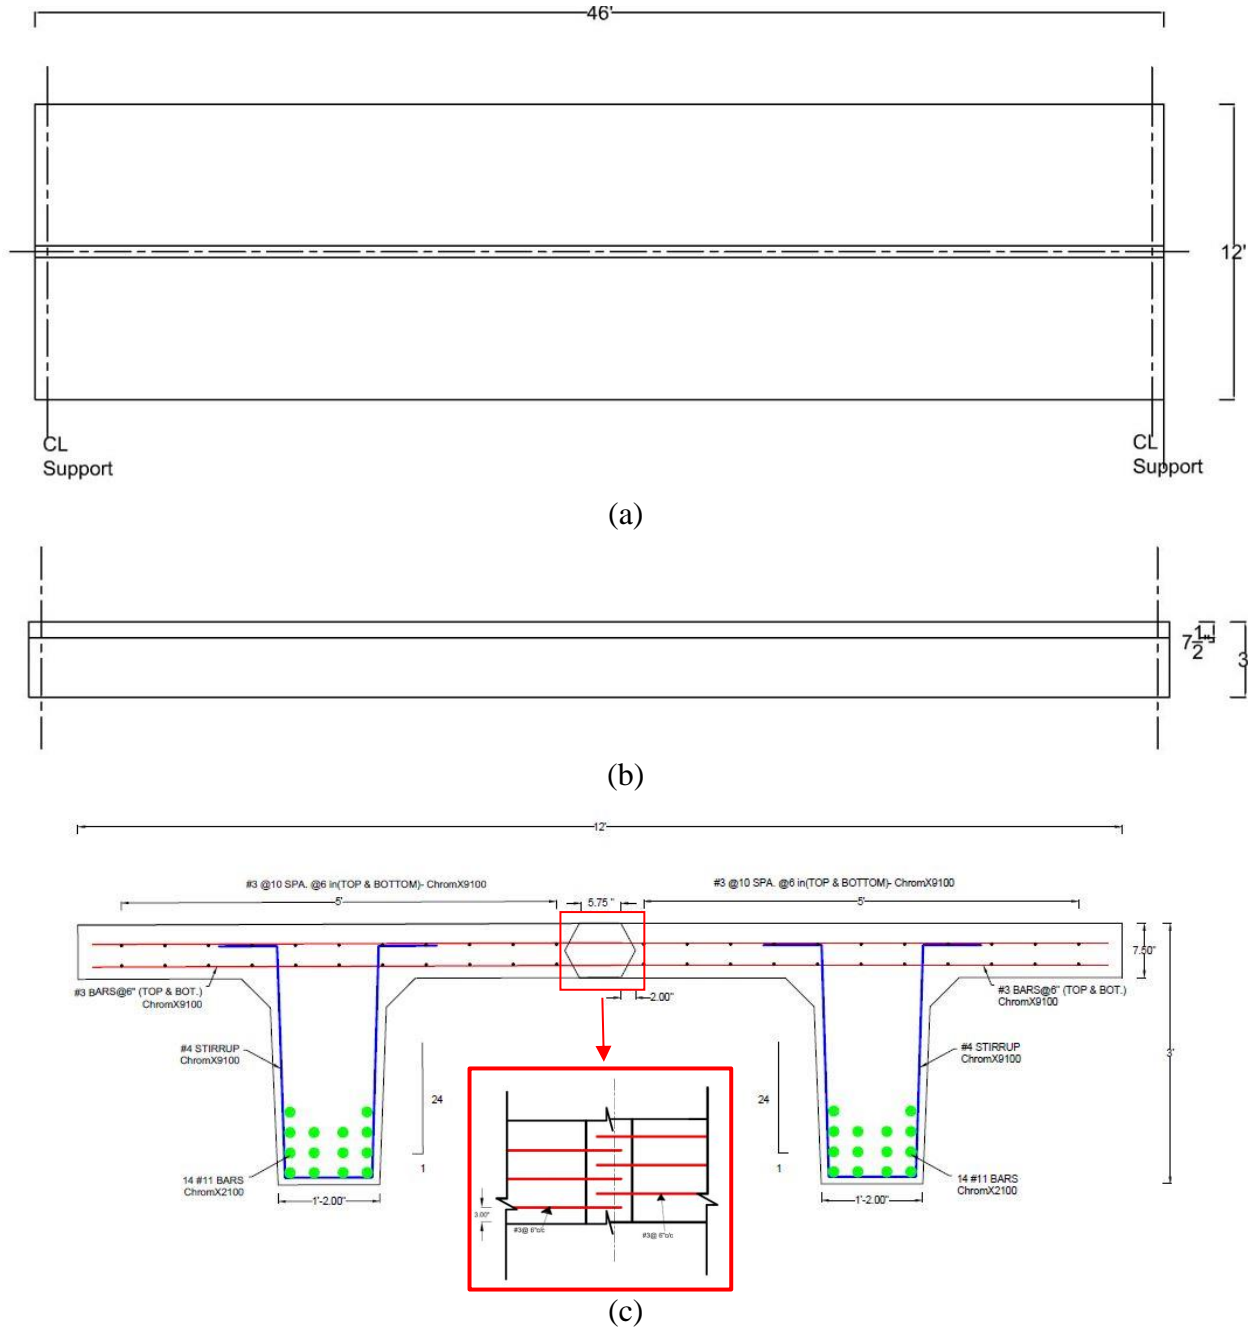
(a) Plan, (b) elevation, and (c) section view of the specimen
